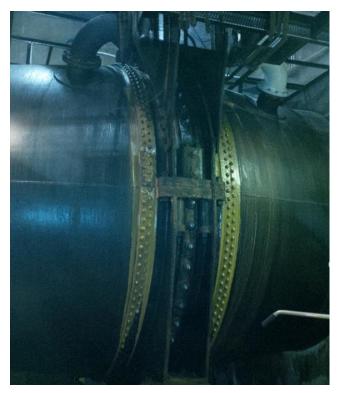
Vertical butterfly valve with riveted connection to both penstock extension and scroll case extension
